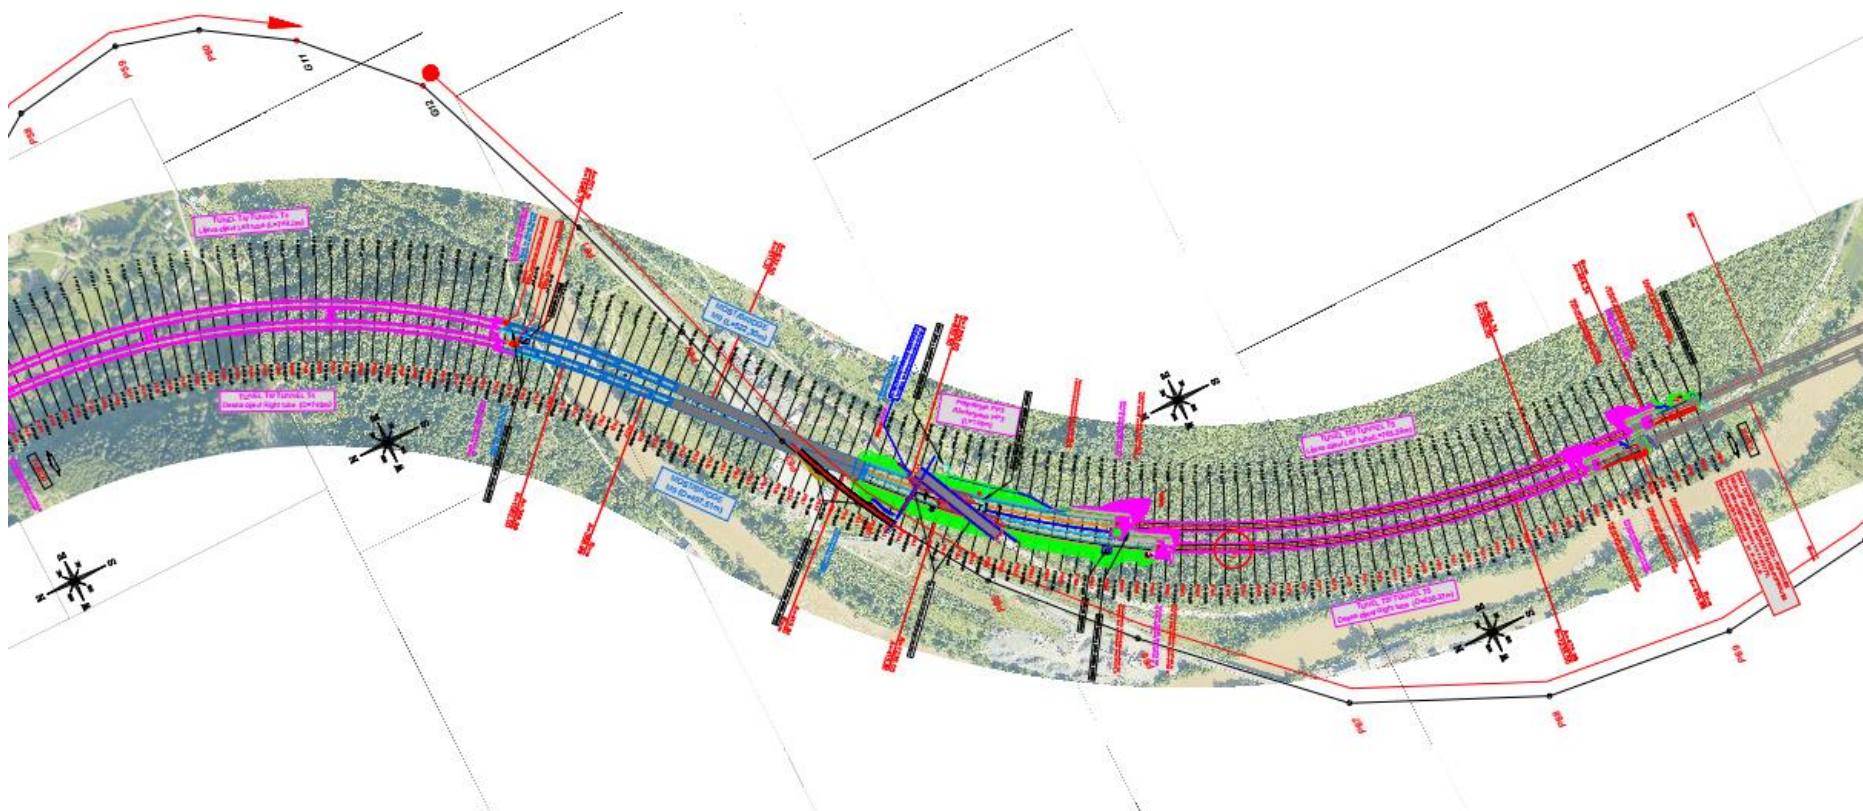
End of subsection with bridge over Bosna river (No. 9) crosses over existing main road, railway and tunnel Želeča. Before the entrance to the Tunnel T5, and next to the underpass for the passage of the railway line, we have additional expropriation and resettlement, which are processed by this RAP.
